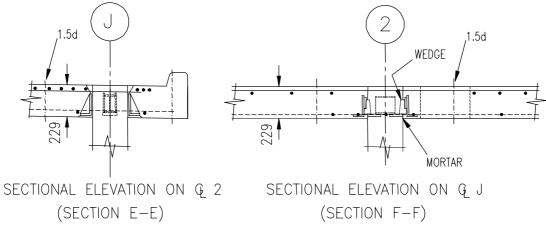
3 Reinforcement and shear head 'collar' at J2.
